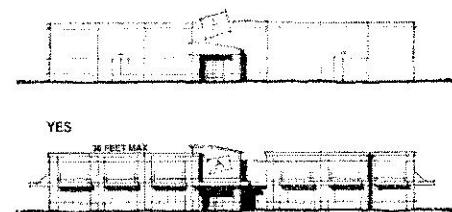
No wall that faces a street or connecting pedestrian walkway shall have a blank, uninterrupted length exceeding thirty (30) feet without including architectural features such as columns, ribs, pilasters or piers, changes in plane, changes in texture or masonry pattern, or an equivalent element that subdivides the wall into human scale proportions.
